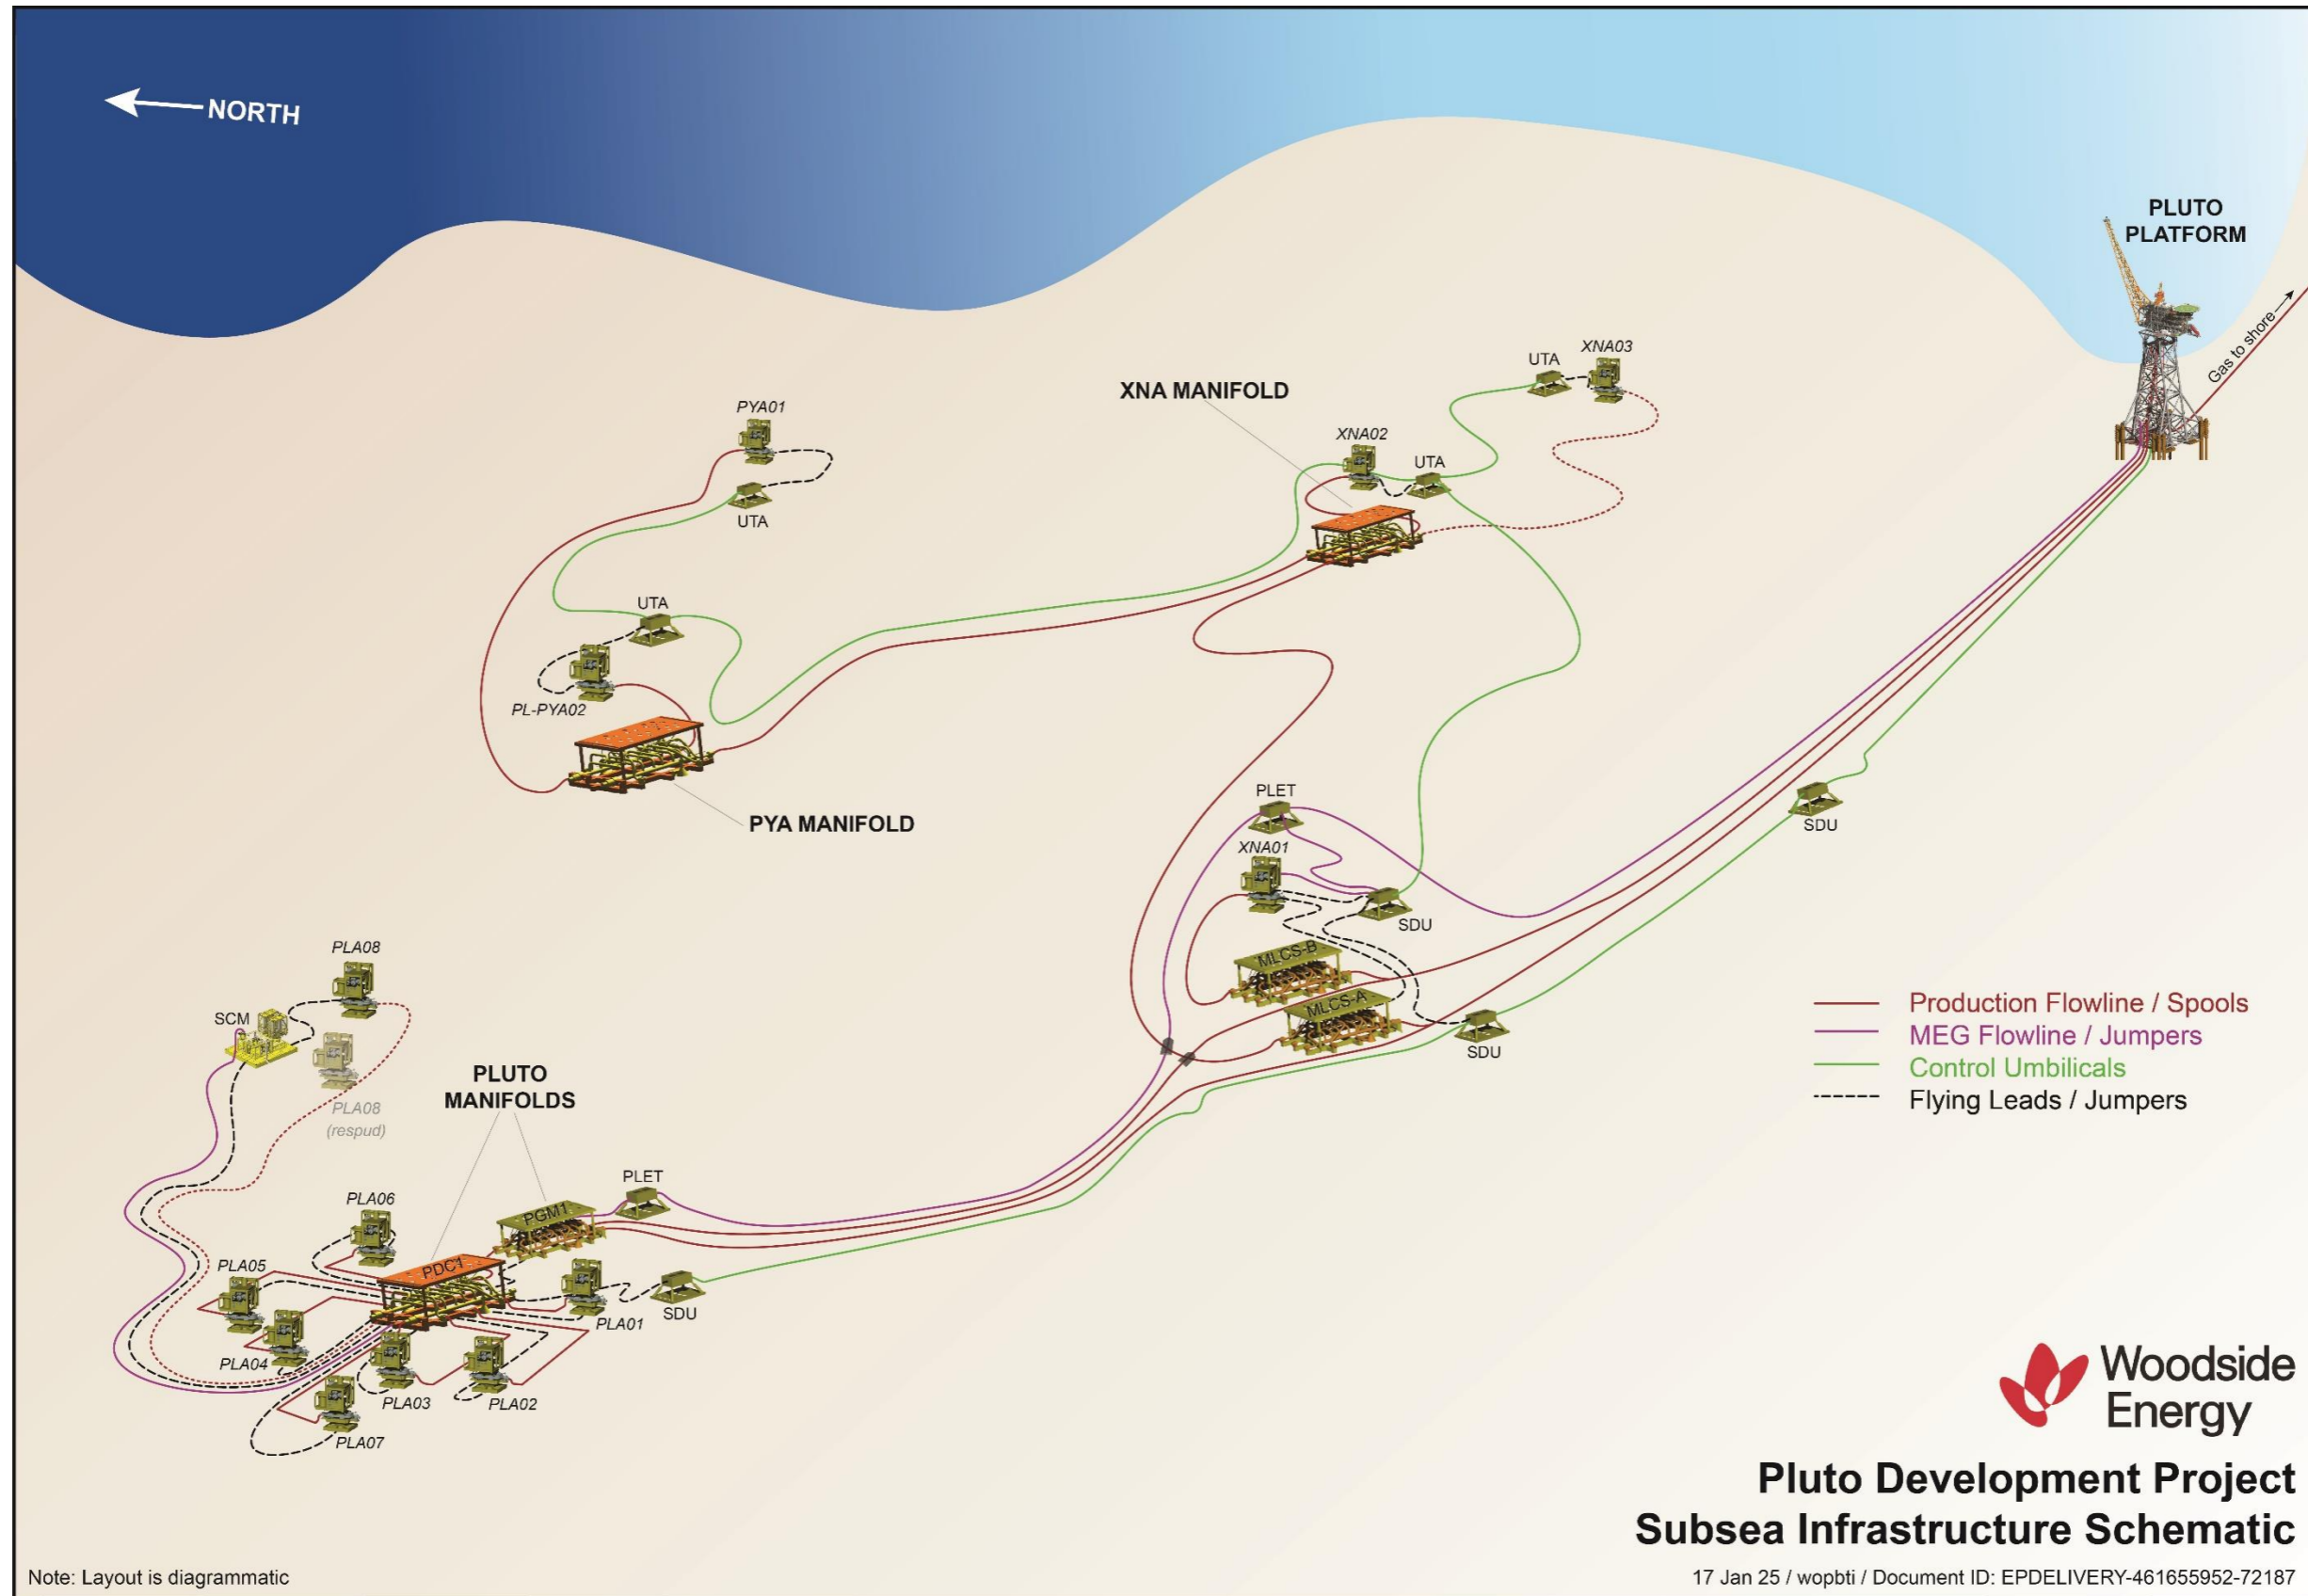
Layout of the Pluto facility subsea infrastructure
